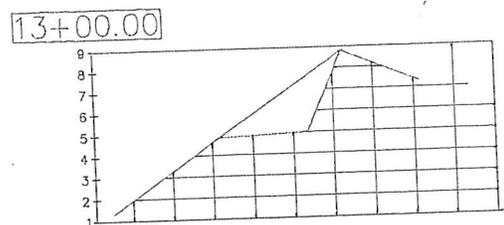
typical section approximately 200' south of Stone Groin 3 (approximately Station 177+50 on the Mass Highway Department permit plan)
